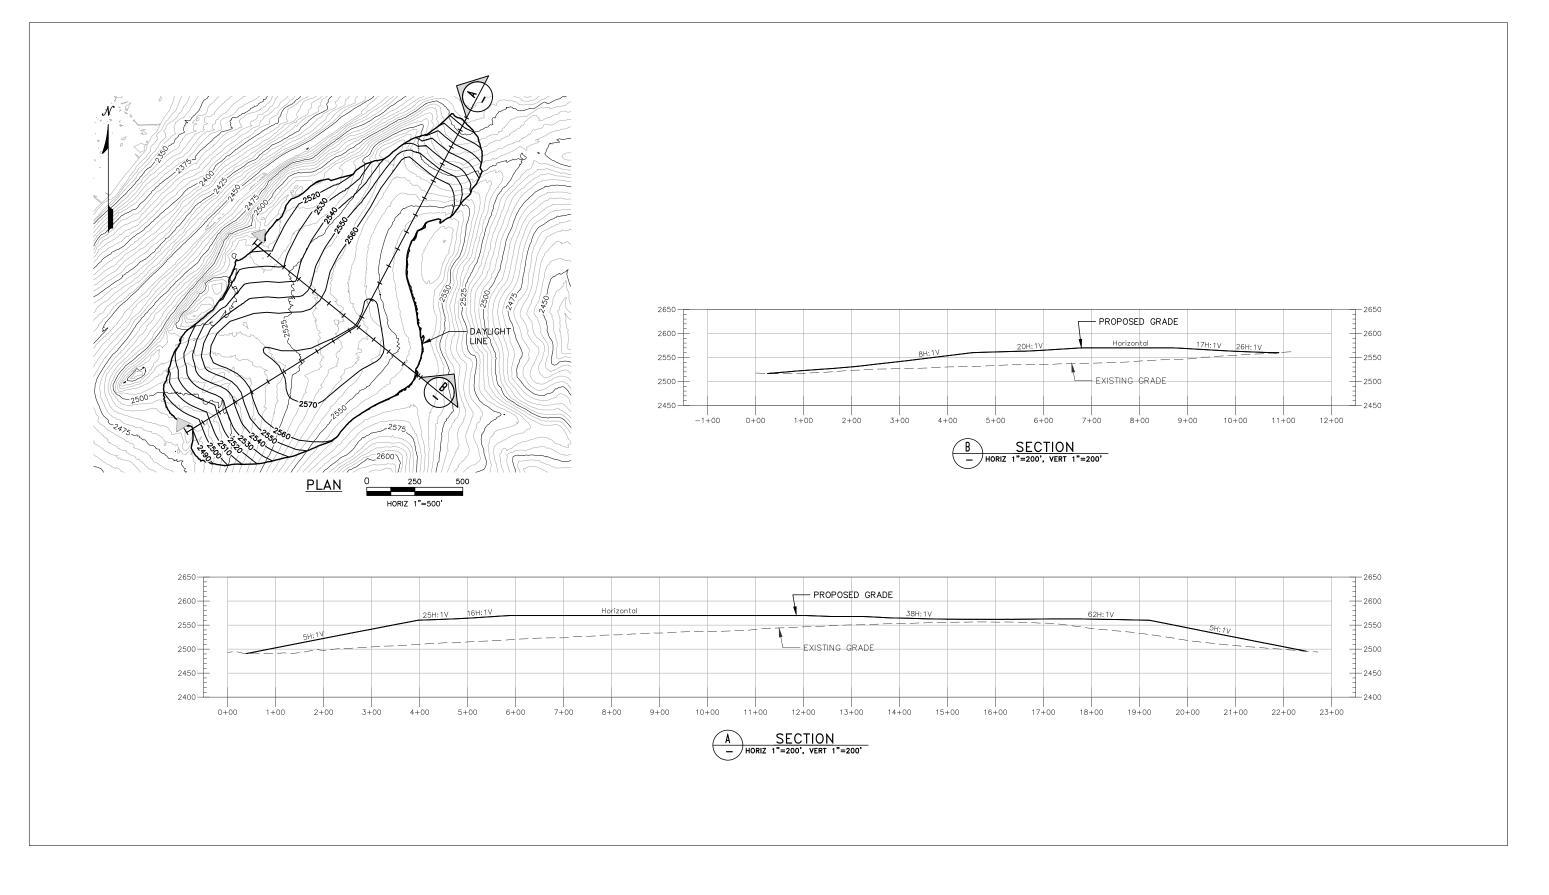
Iron Gate Disposal Site Plan & Sections
